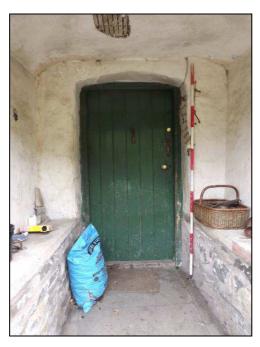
Detail of main entrance housed within the porch, south-west elevation
